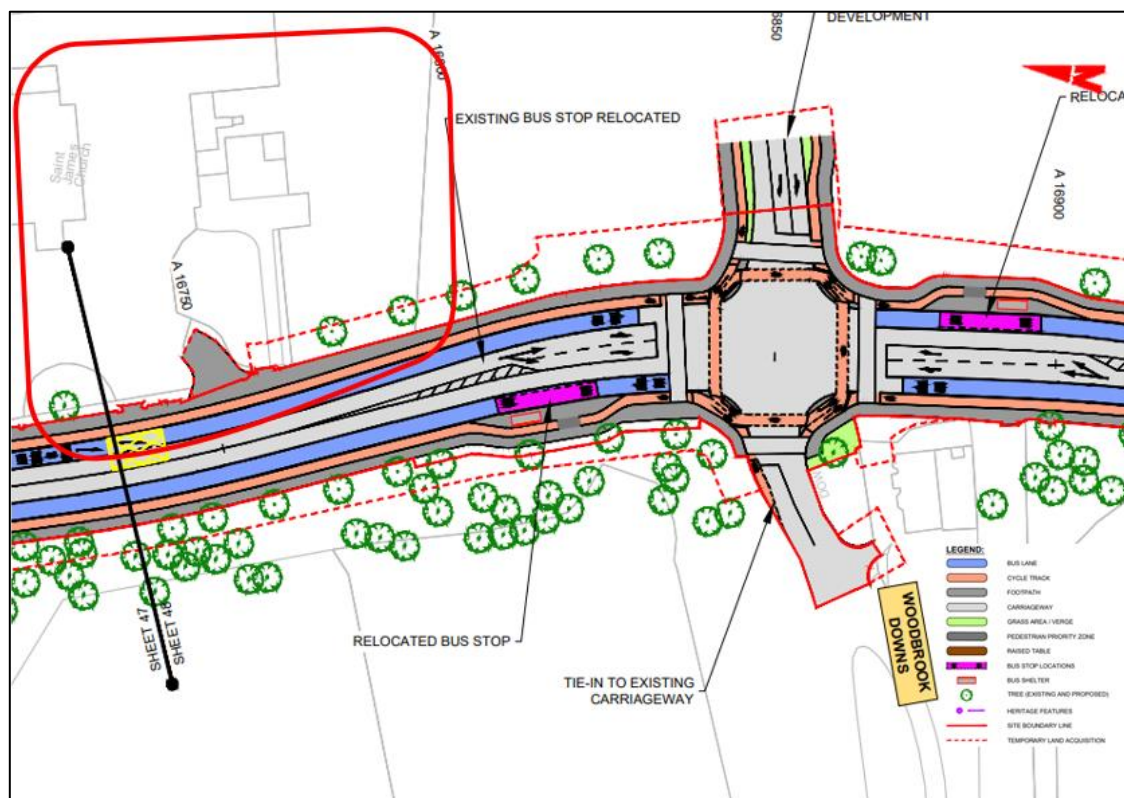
Extract from General Arrangement Drawing at Dublin Road (Sheet 48)
